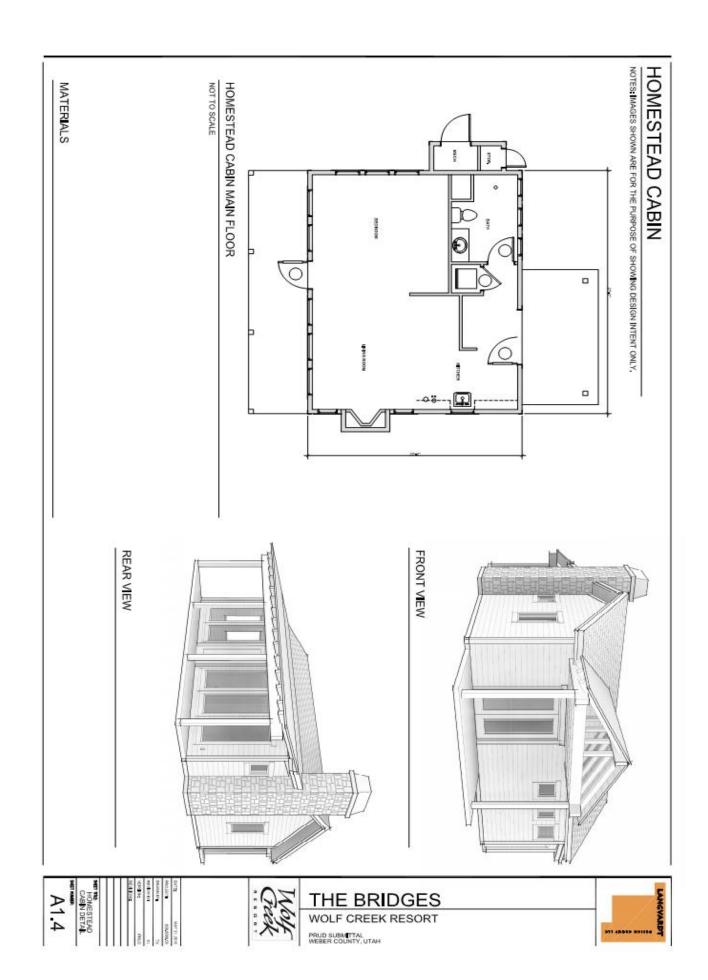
Exhibit C-Wolf Creek Zoning Development Conceptual Plan
